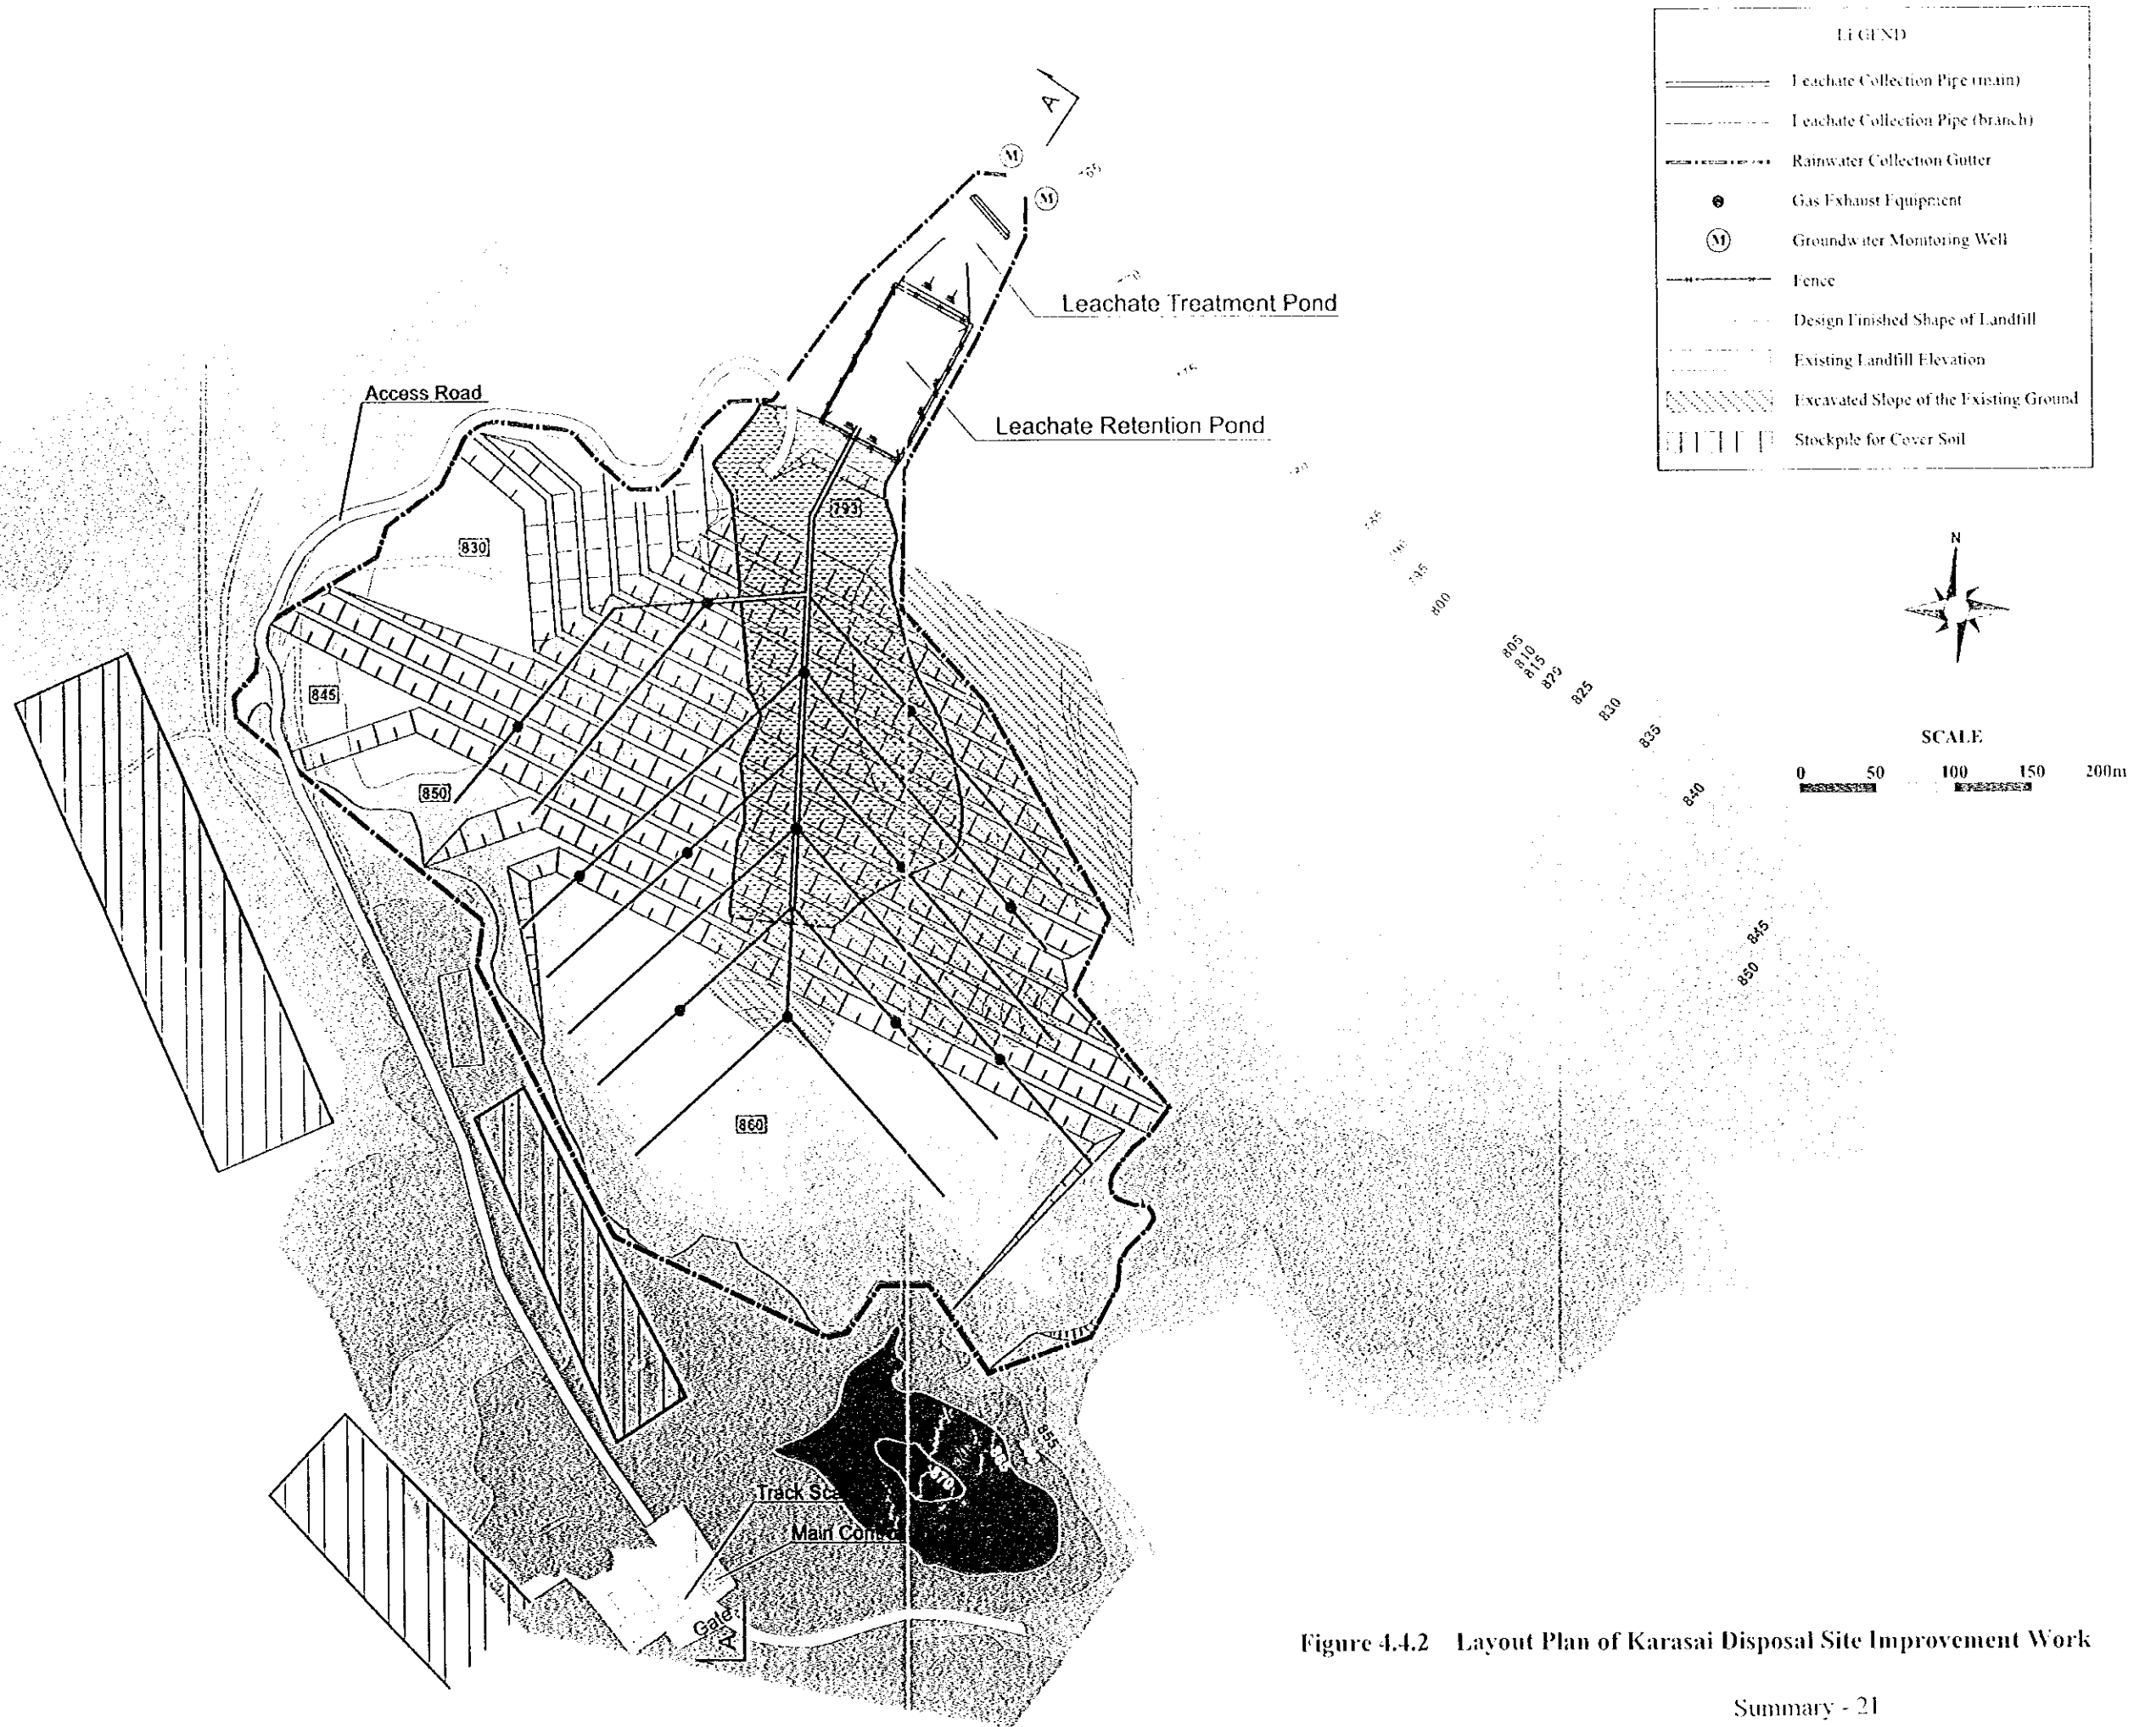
Layout Plan of Karasai Disposal Site Improvement Work
